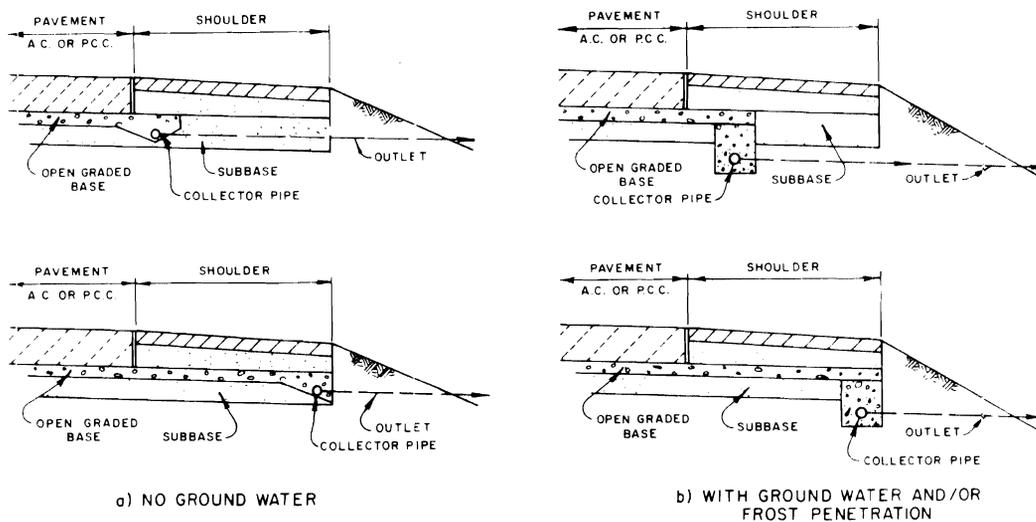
Typical Cross Sections of Subdrainage Systems
